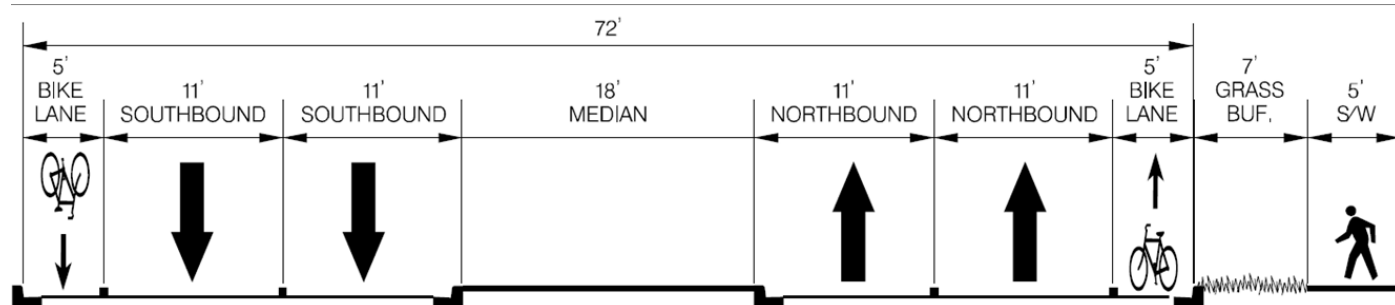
Proposed Cross-section for Ridge Road from Bear Paw Lane to Stone Run Dr.
